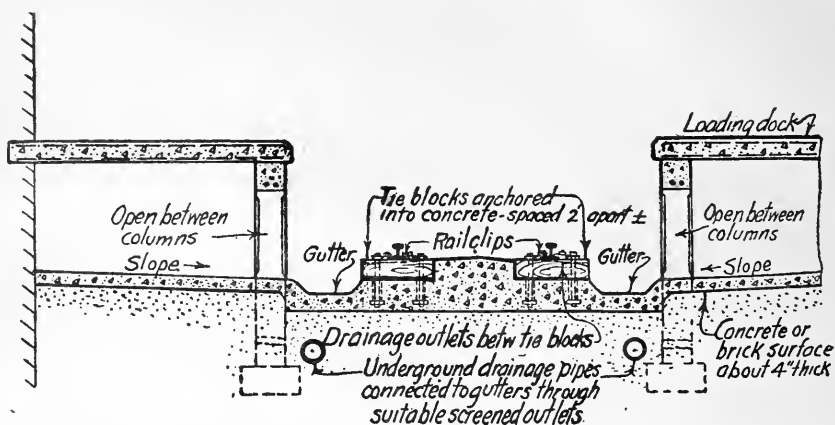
Railroad loading track and dock with open side, concrete surfacing and gutters, and rails carried on removable tie blocks.
